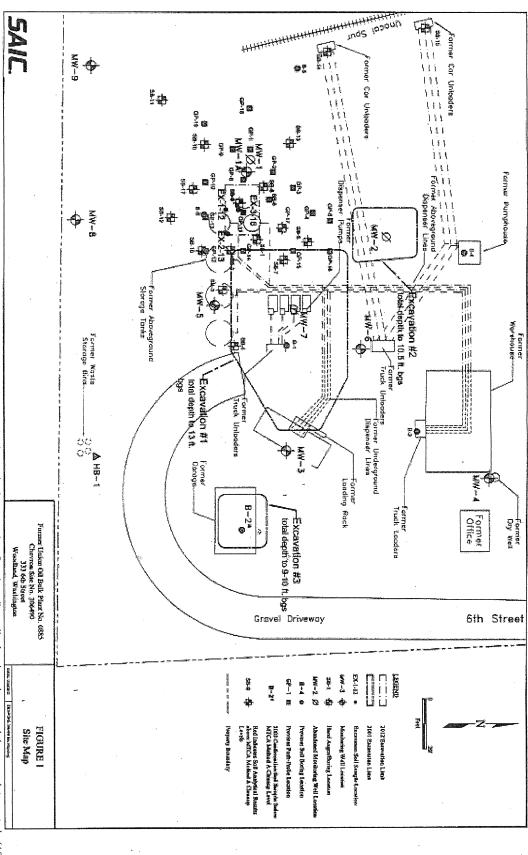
Site Map for Soil Unocal Bulk Plant Site in Woodland, WA, shown in the map including soil investigation borings, cleanup action (excavations) extent and confirmation soil sampling locations, the removed aboveground storage tanks (ASTs) locations, and groundwater monitoring wells locations at the (Source: SAIC, Site Summary Report, February 2013)
